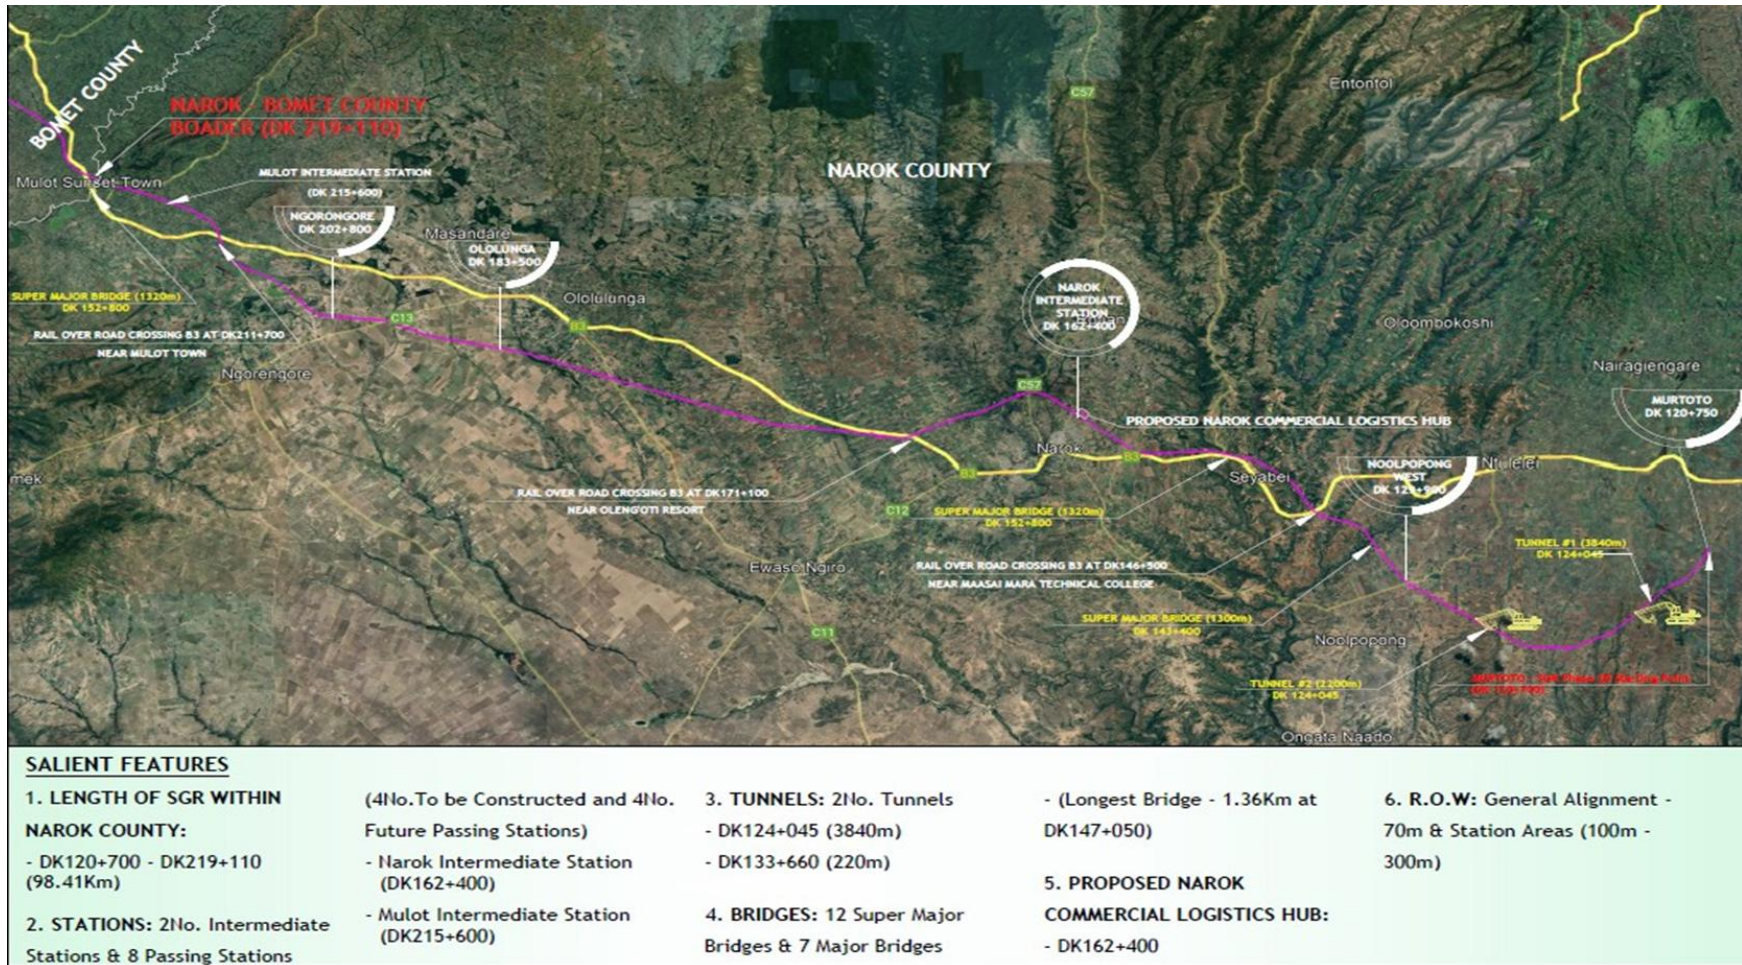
Concept layout plan SGR Phase 2B Alignment – Narok County
